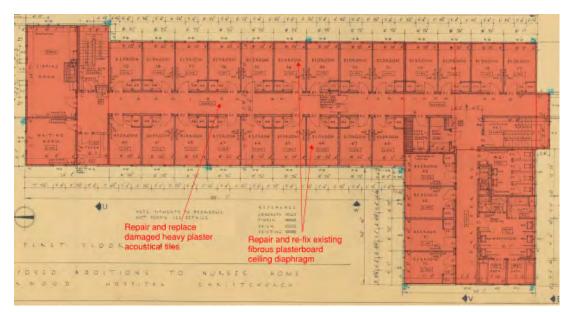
West Wing - First Floor Plan - Repairs Required
